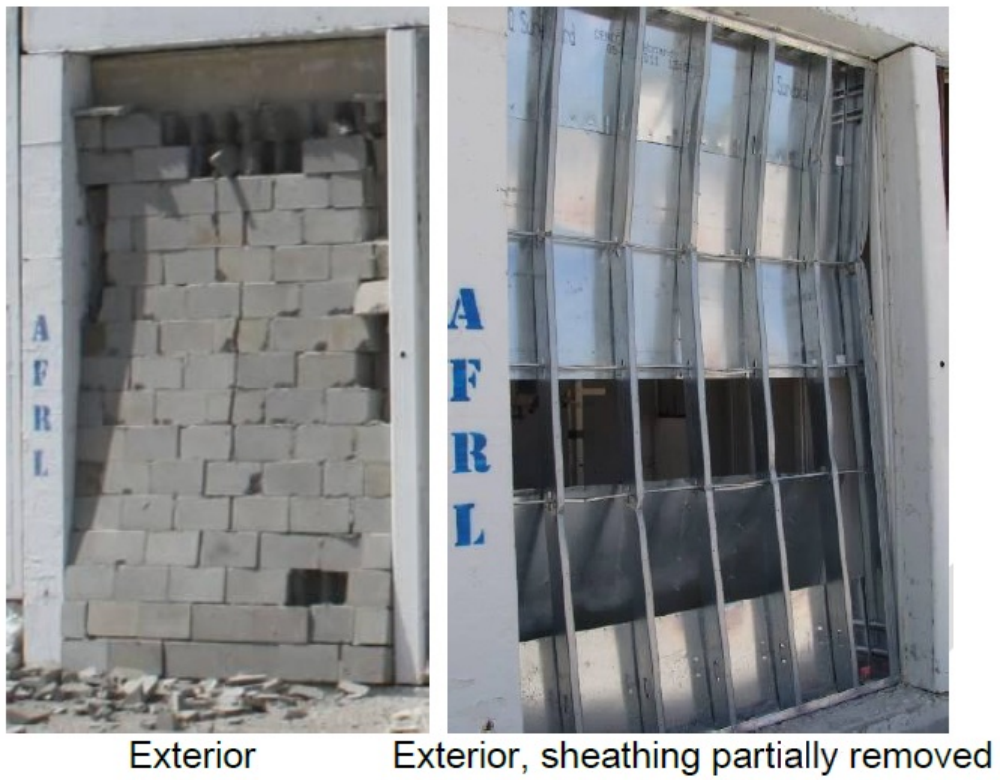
Response of un-grouted masonry + Sure-Board® wall specimen to blast [36]
